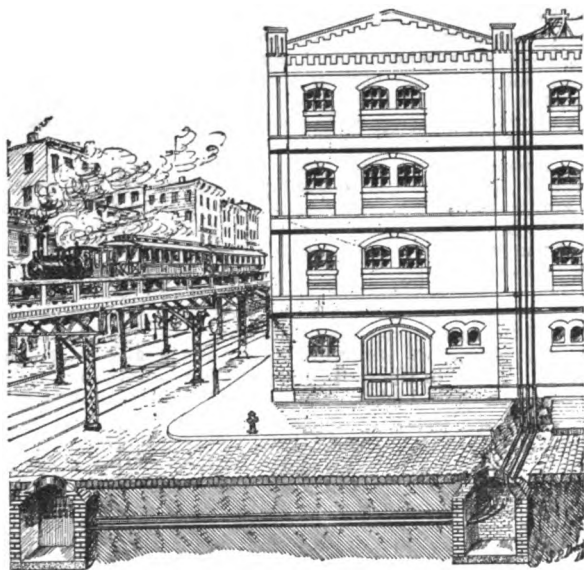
House-top Distribution, Sixth Avenue and Fifty-first Street, New York.
